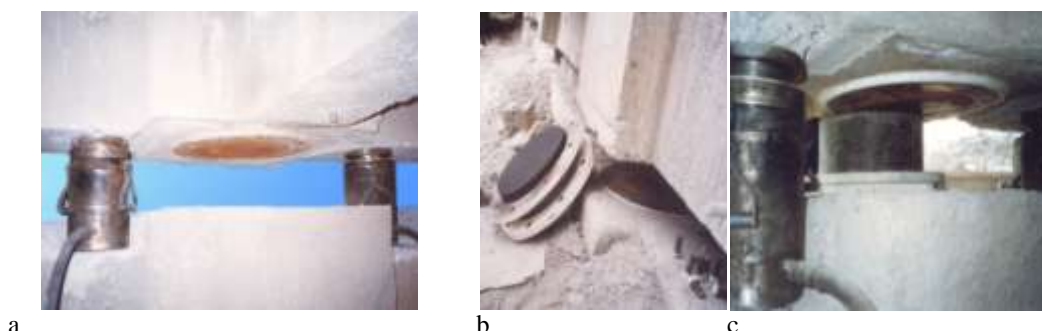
Location of SILRSB by upper and lower recesses provided by annular steel rings bolted to the outer steel plates connected to reinforcement in the upper continuous beam and lower foundation (stepped footing)
